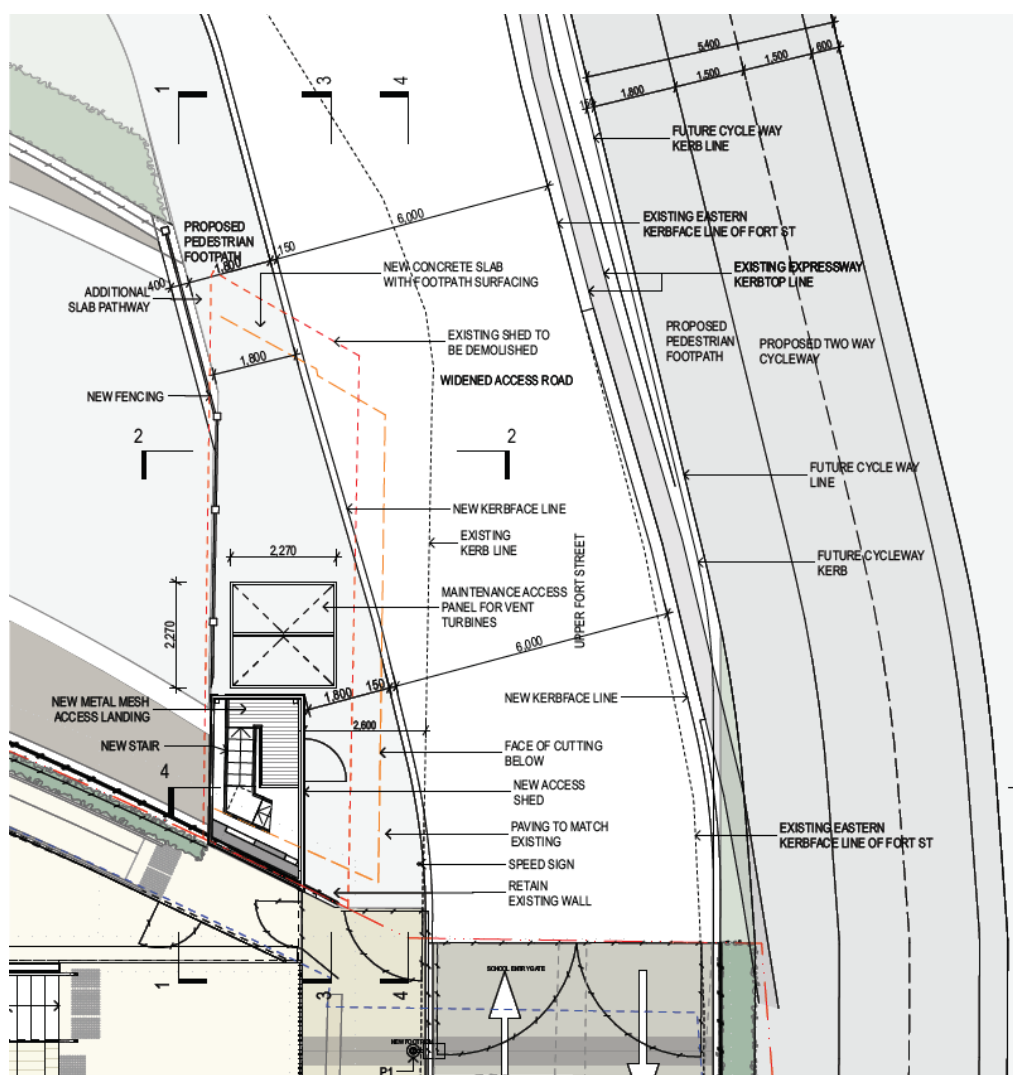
Plan of Upper Fort Street and new Bradfield Shed
